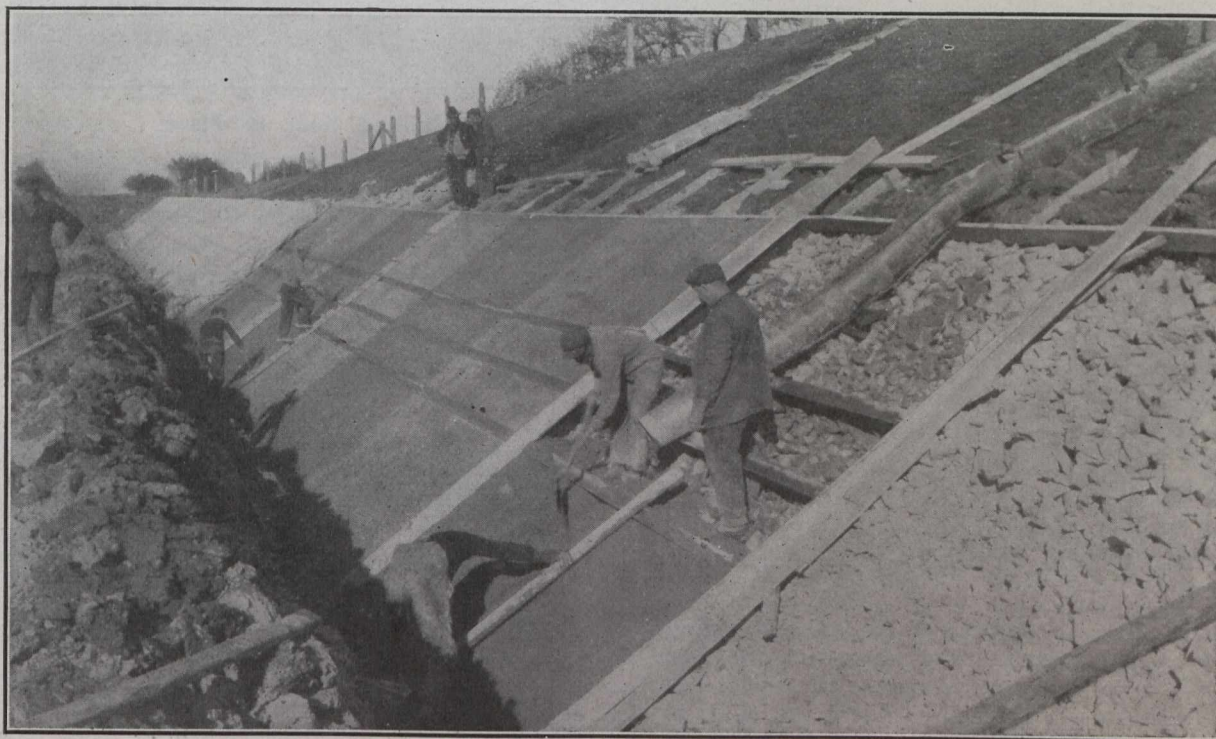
Concrete Slab Construction Showing Crushed Stone Foundation and Sodded Slope Above.
